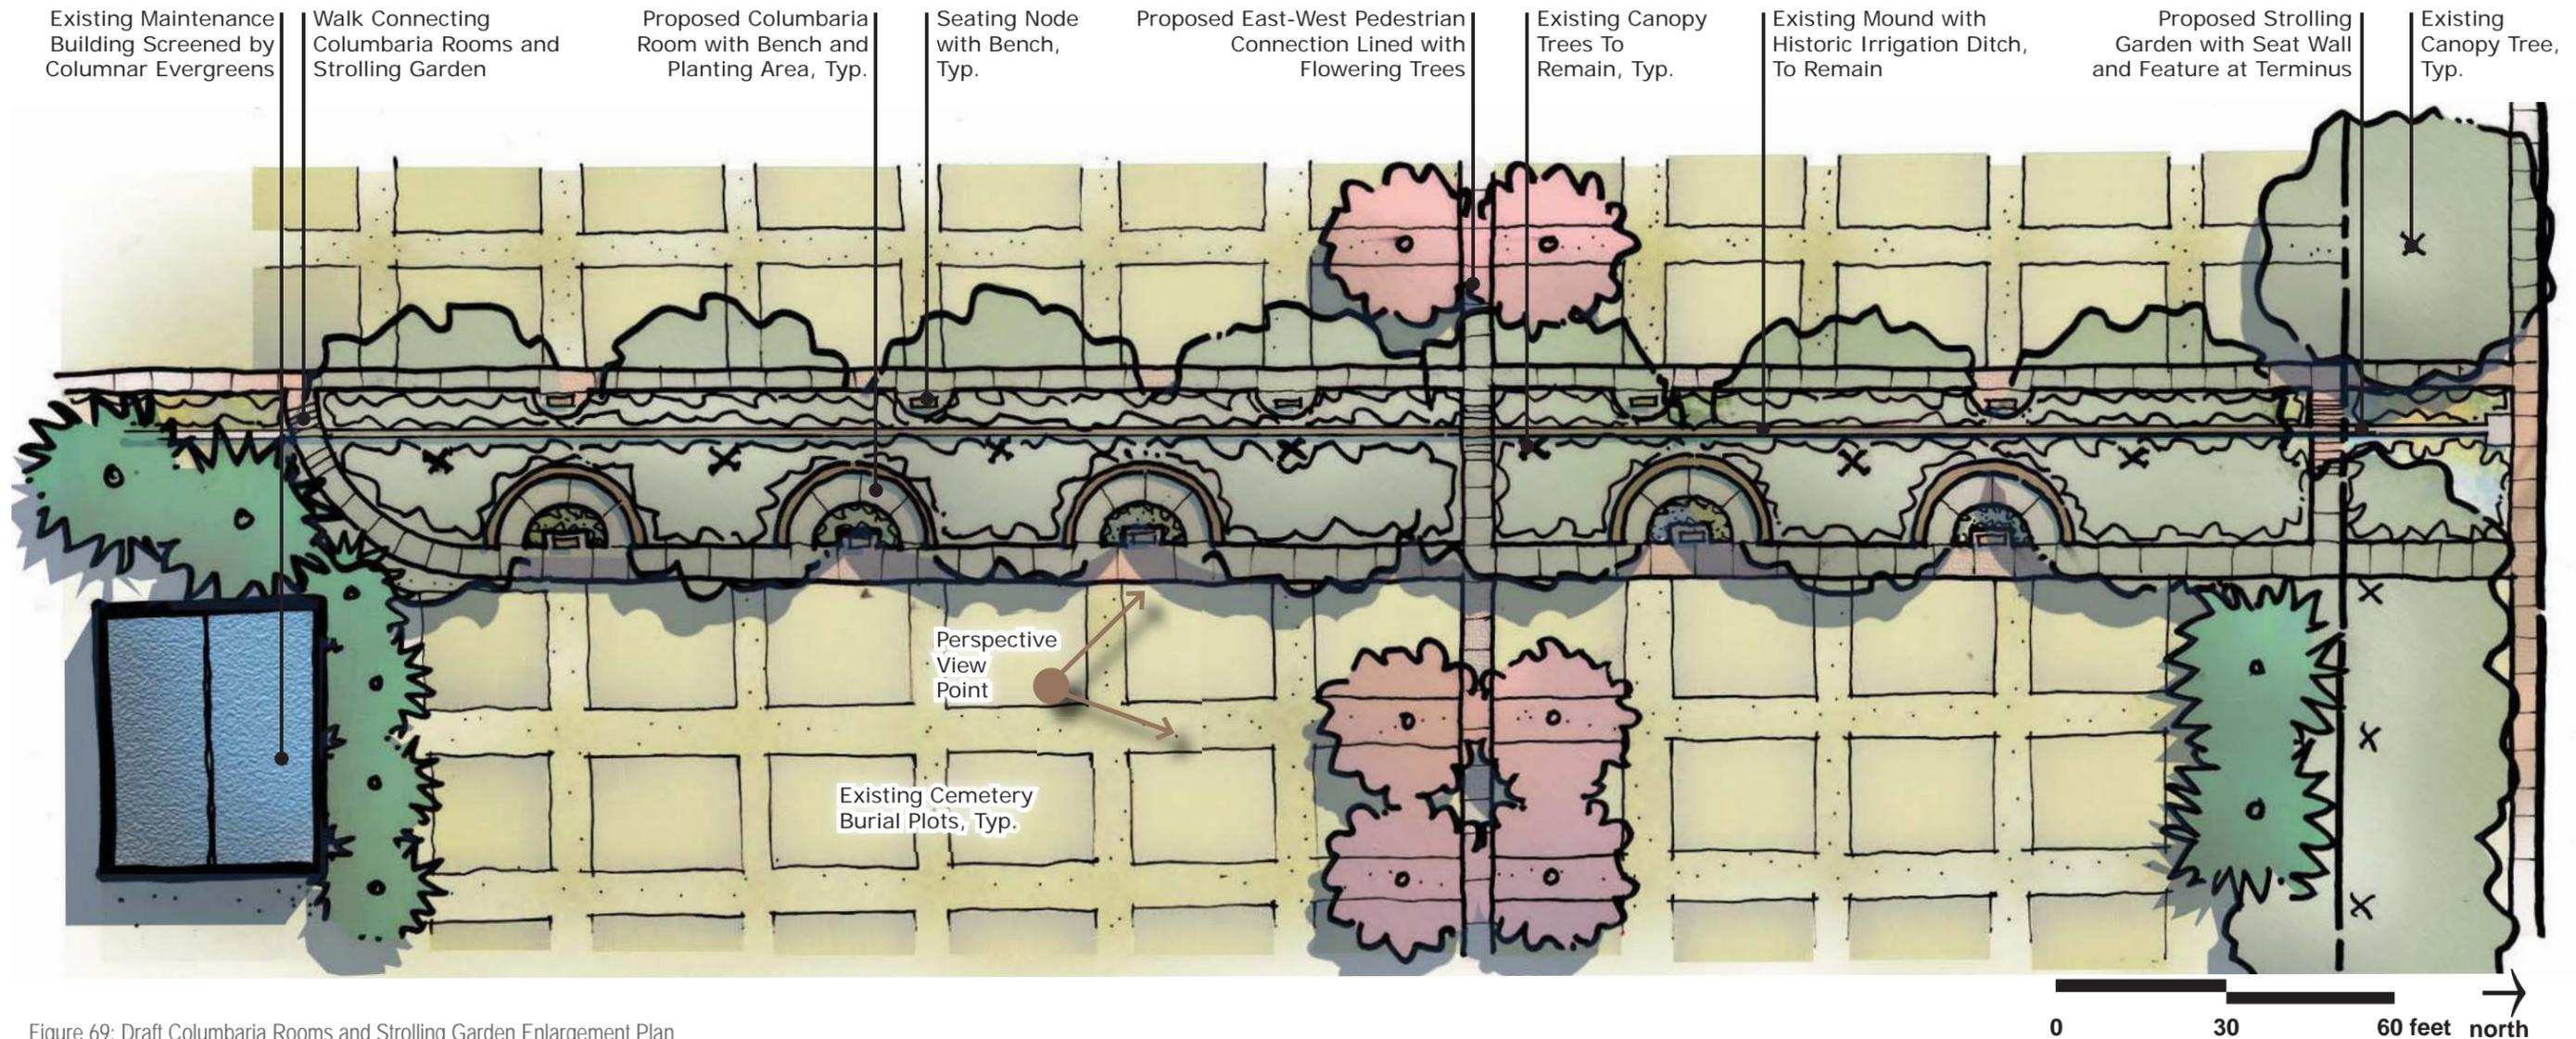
Draft Columbaria Rooms and Strolling Garden Enlargement Plan
